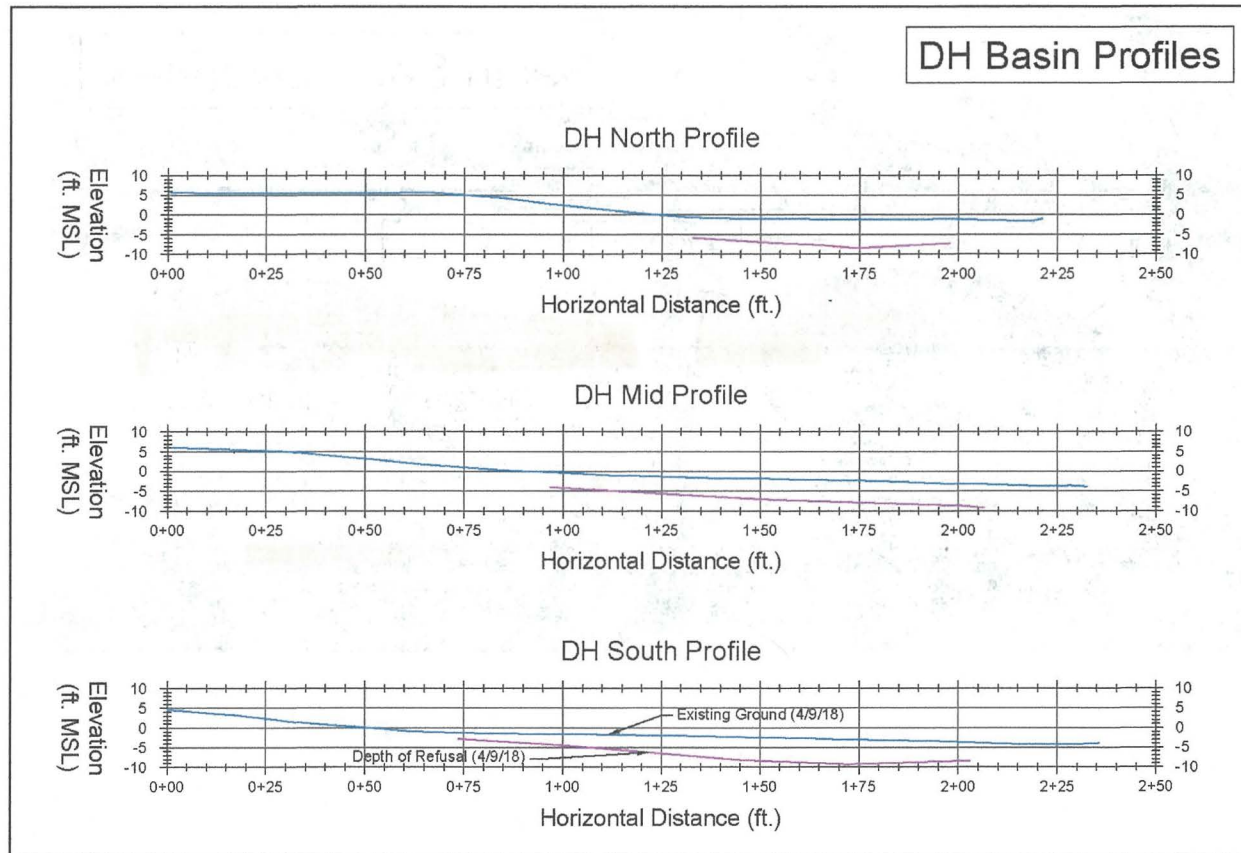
Diamond Head crib wall basin transect profiles
